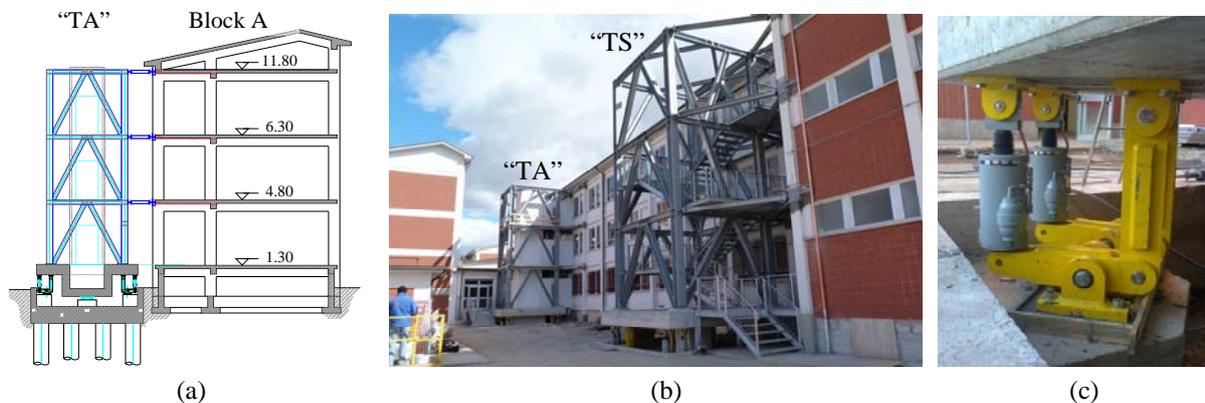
(a) Elevation section; (b) lateral view of block A with dissipative towers; and (c) dissipative devices.
